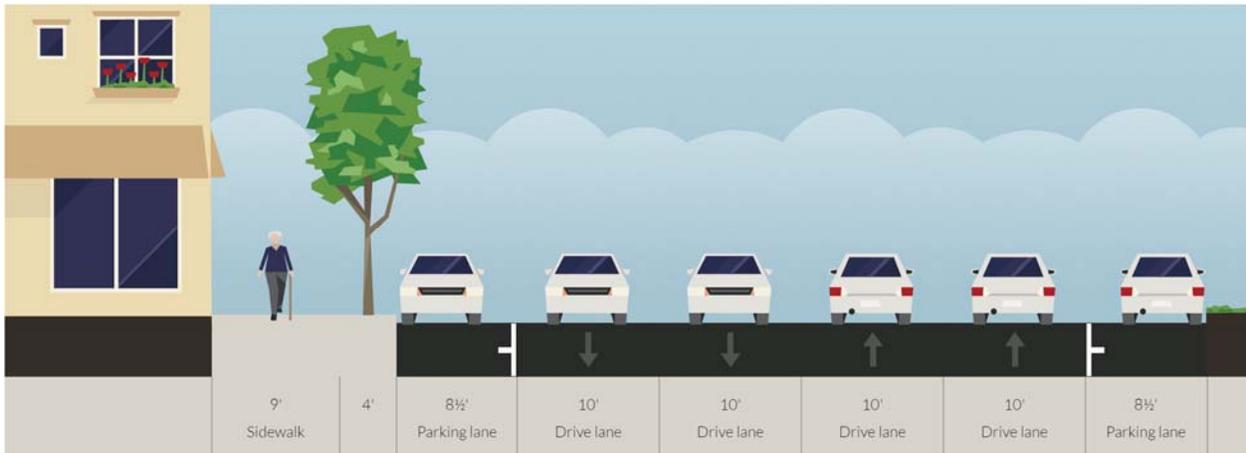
EXISTING SECTION OF GREEN BAY ROAD (SPRUCE – ELM)
